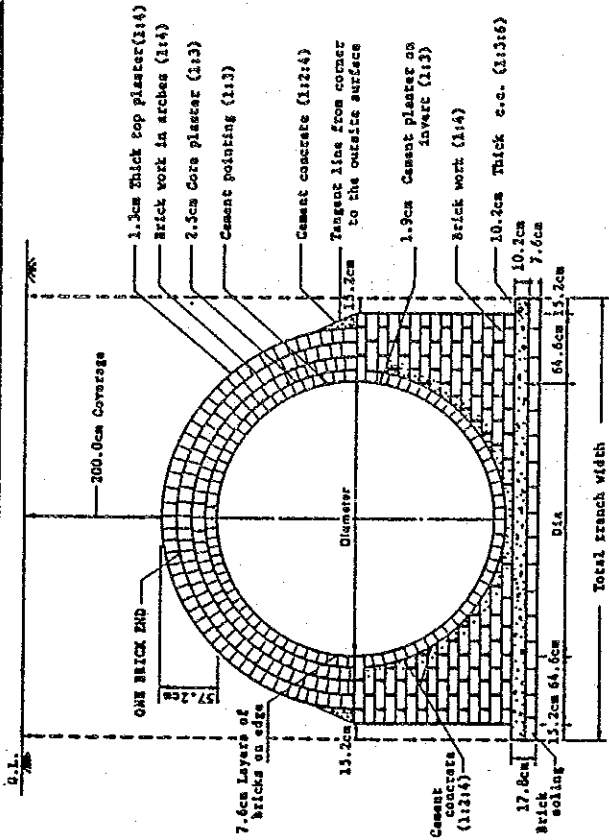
TYPICAL DESIGN OF RC-BOX CULVERTS AND BRICK PIPES
